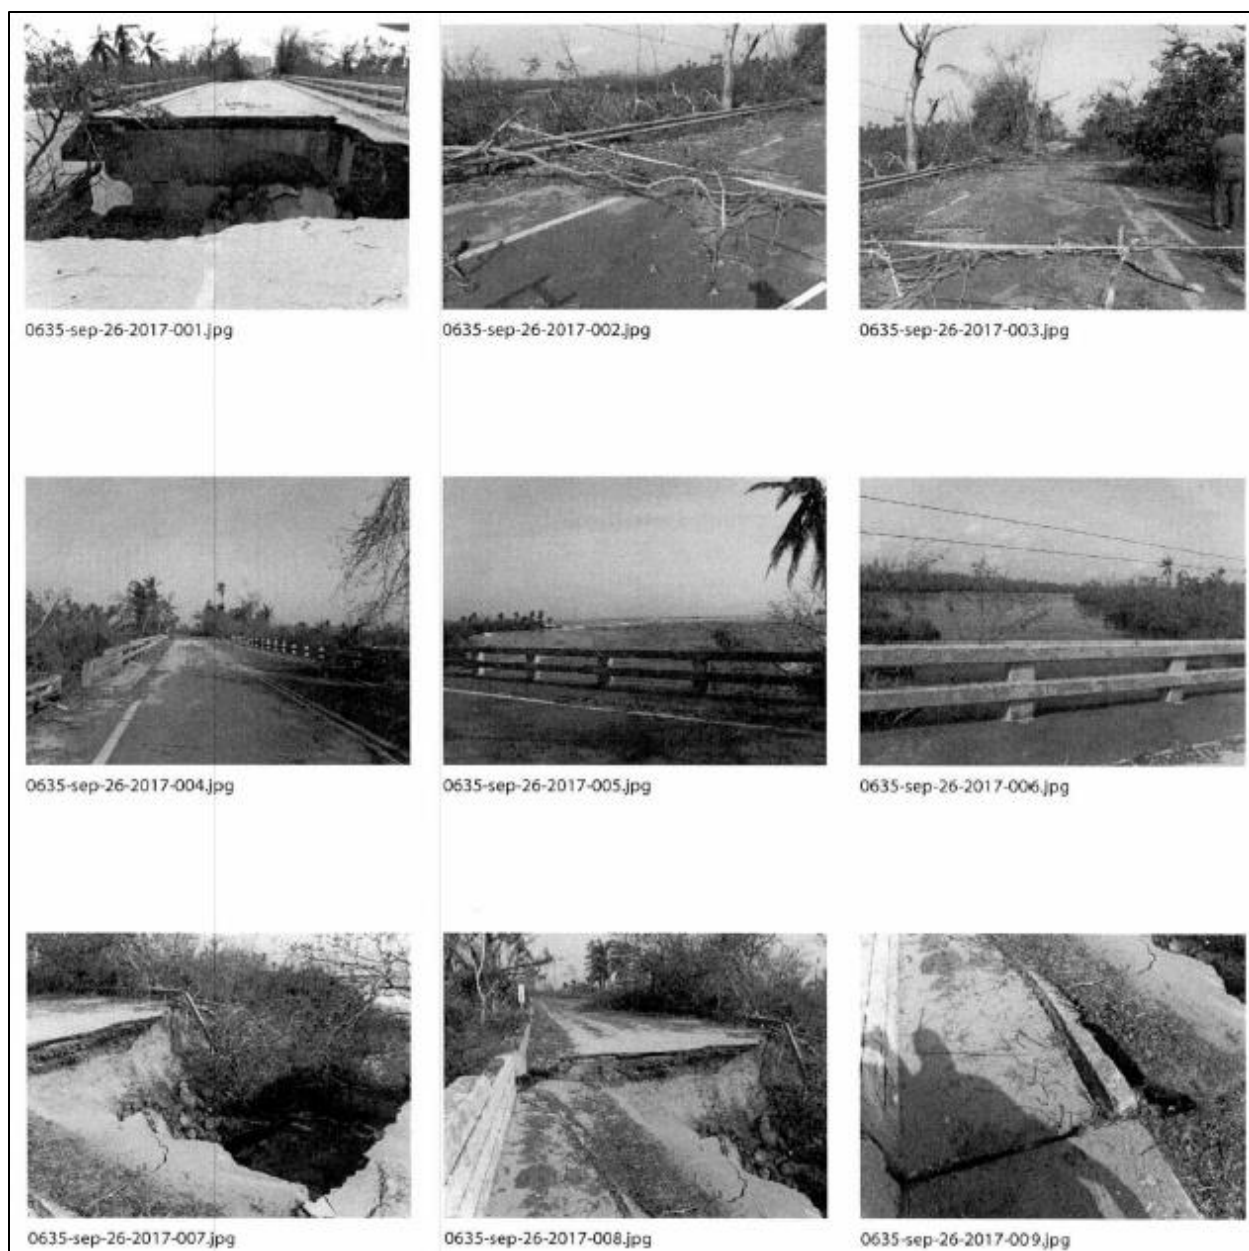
Bridge 635 photos from September 26, 2017 inspection (source: PRHTA)
